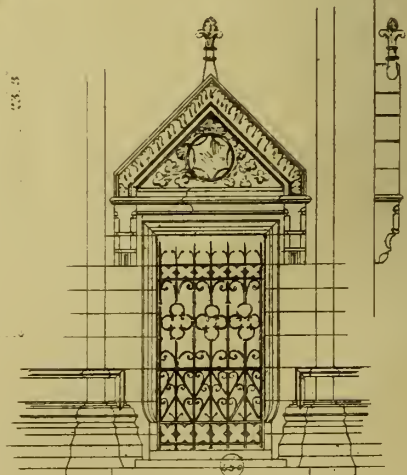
DETAIL OF PUBLIC STAIRCASE TO GALLERIES.
